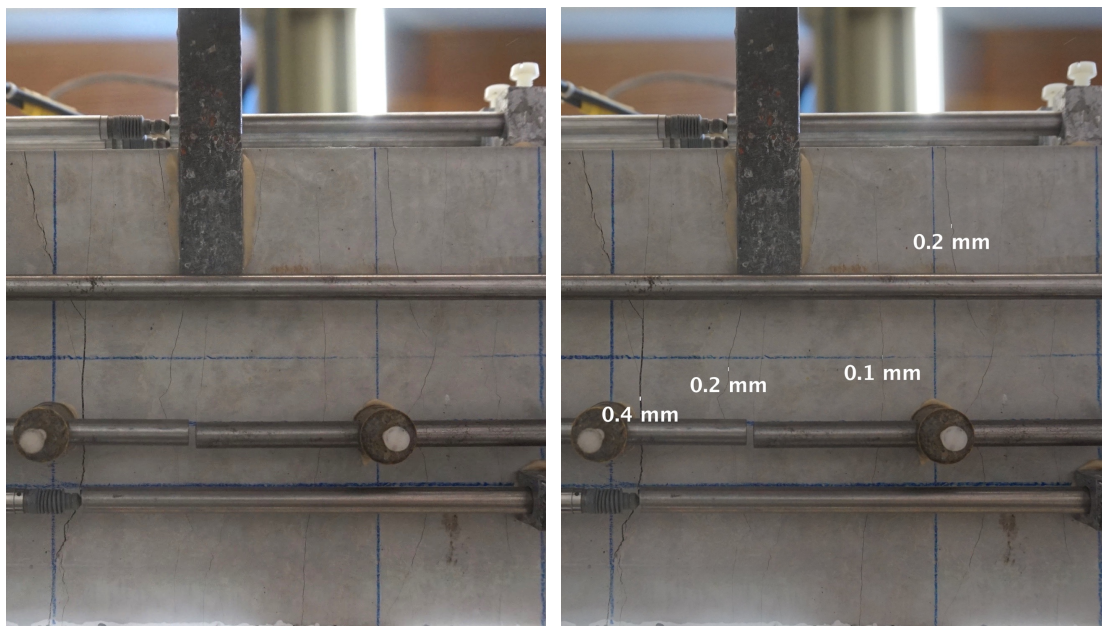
Original (left) and crack width marked (right) photo of the bottom side of the beam
